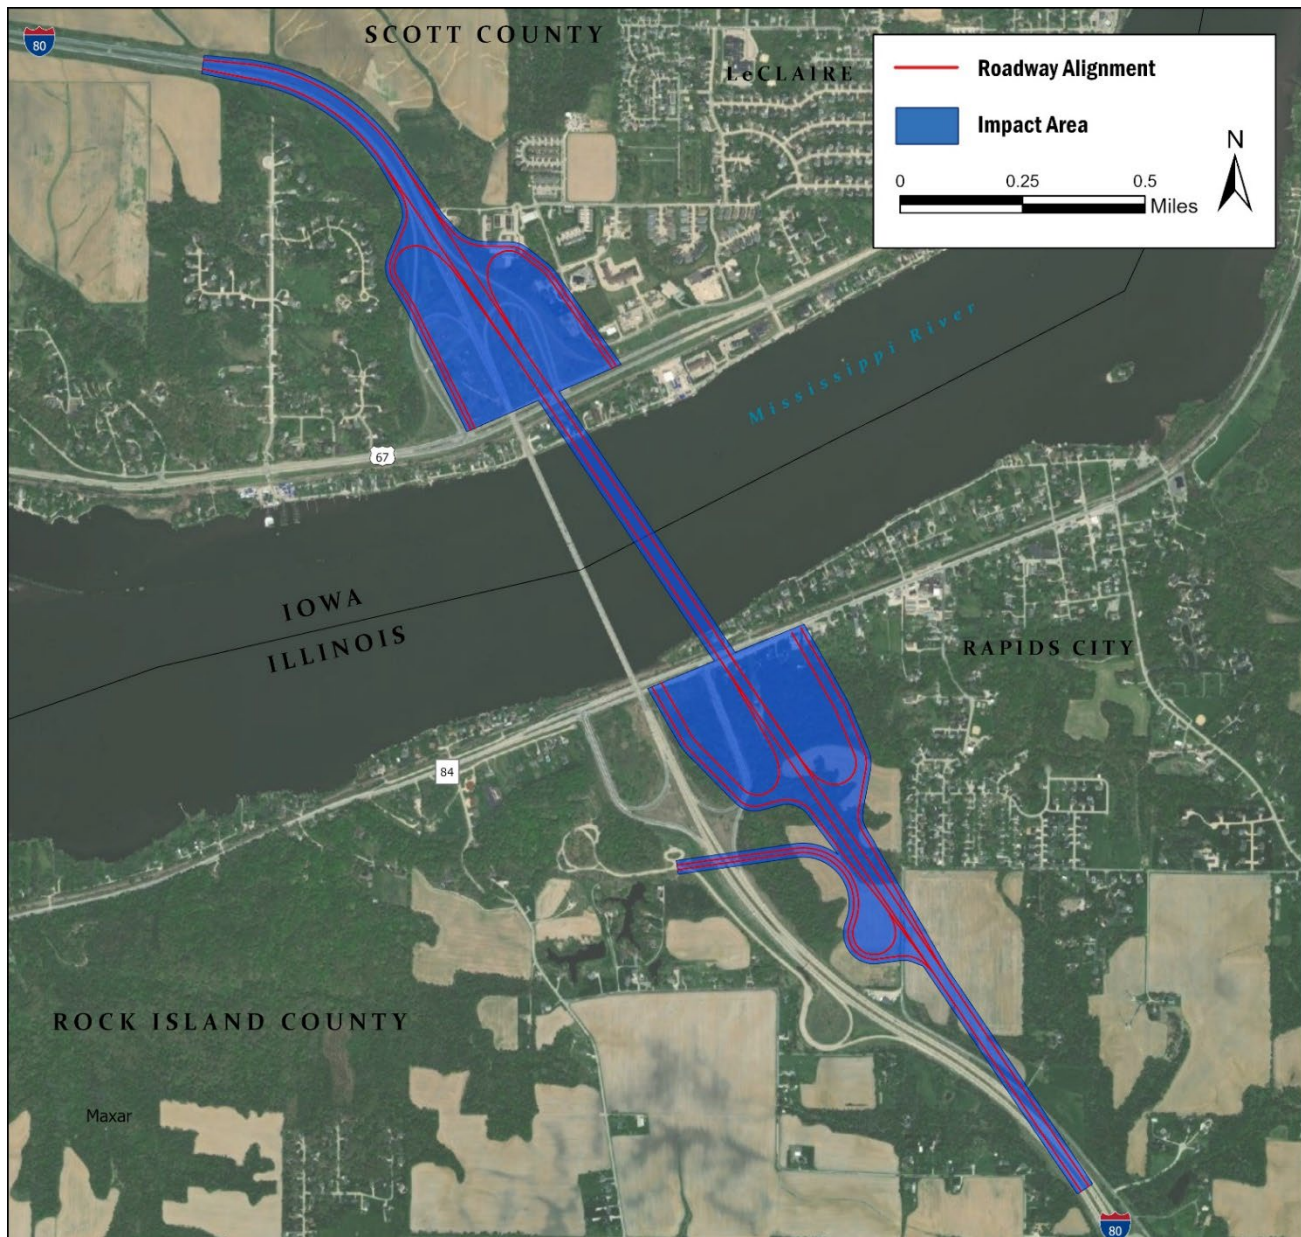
ALTERNATIVE 5 – NEW COMPANION BRIDGE WEST AND REPLACEMENT OF EXISTING BRIDGE
